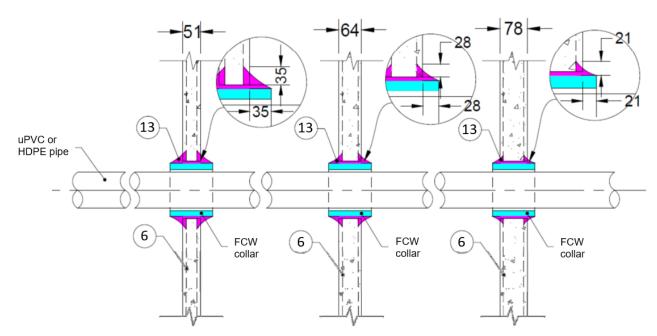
Proposed construction of uPVC and HDPE pipe protected with FCW collar in Speedpanel wall.
